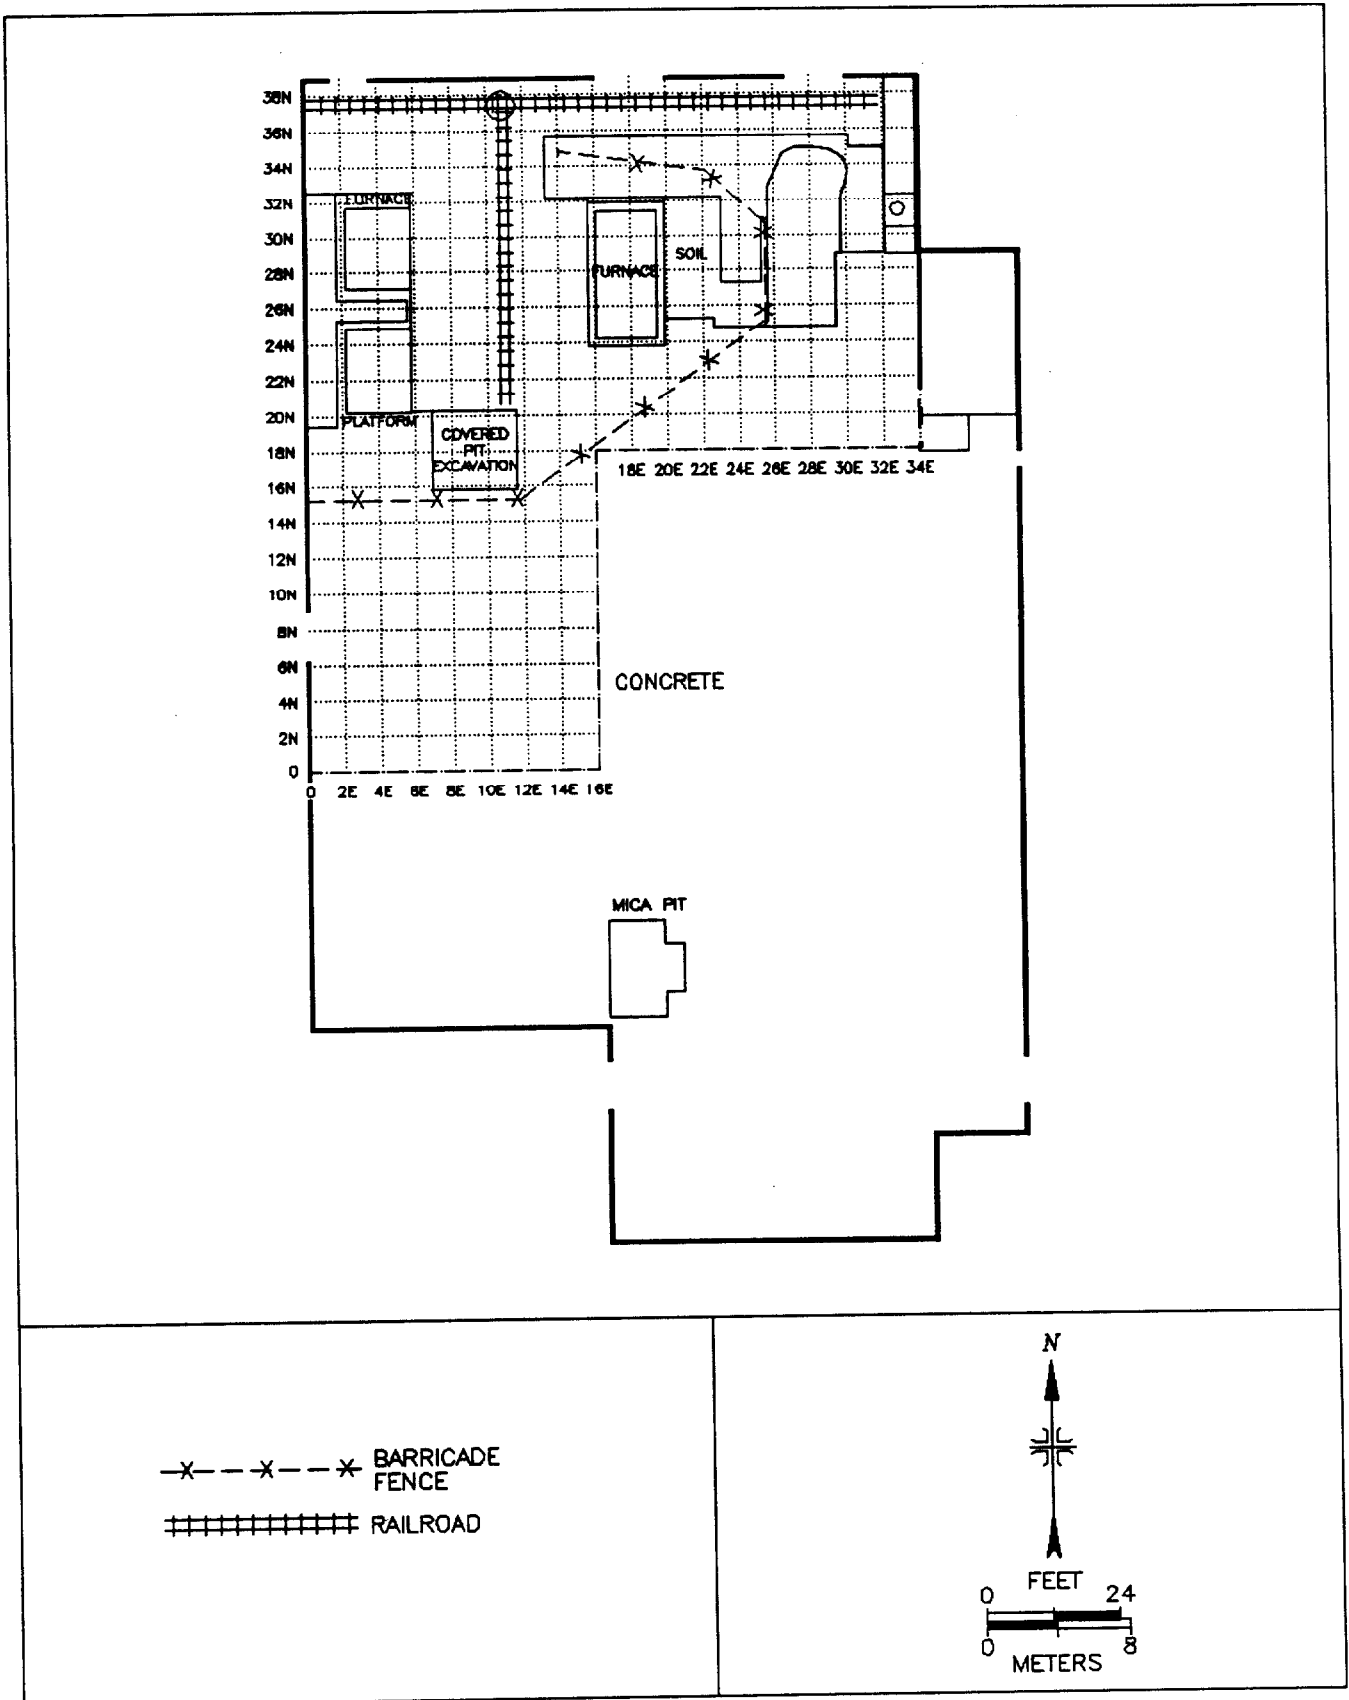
Floor Plan of Building 3 - Reference Grid
